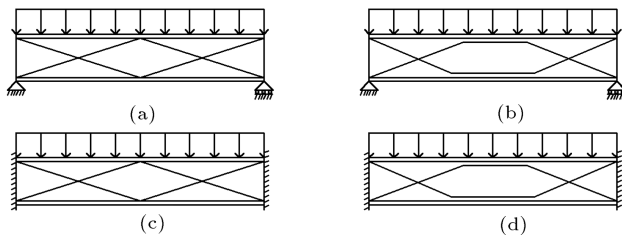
Prestressed symmetric I-shaped steel beams with steel cable under external loading: (a) Simply supported beam along with V-shaped cable pattern, (b) simply supported beam along with modified V-shaped cable pattern, (c) fixed supported beam along with V-shaped cable pattern, and (d) fixed supported beam along with modified V-shaped cable pattern.
